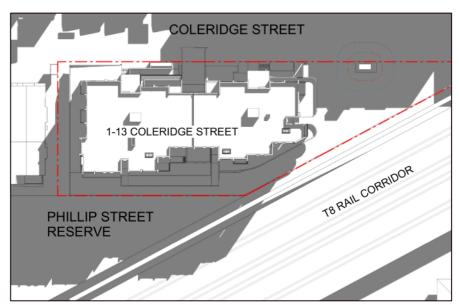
Excerpt from the Architectural Plans – Shadow diagram at 9am midwinter (Source: WMK Architecture)
